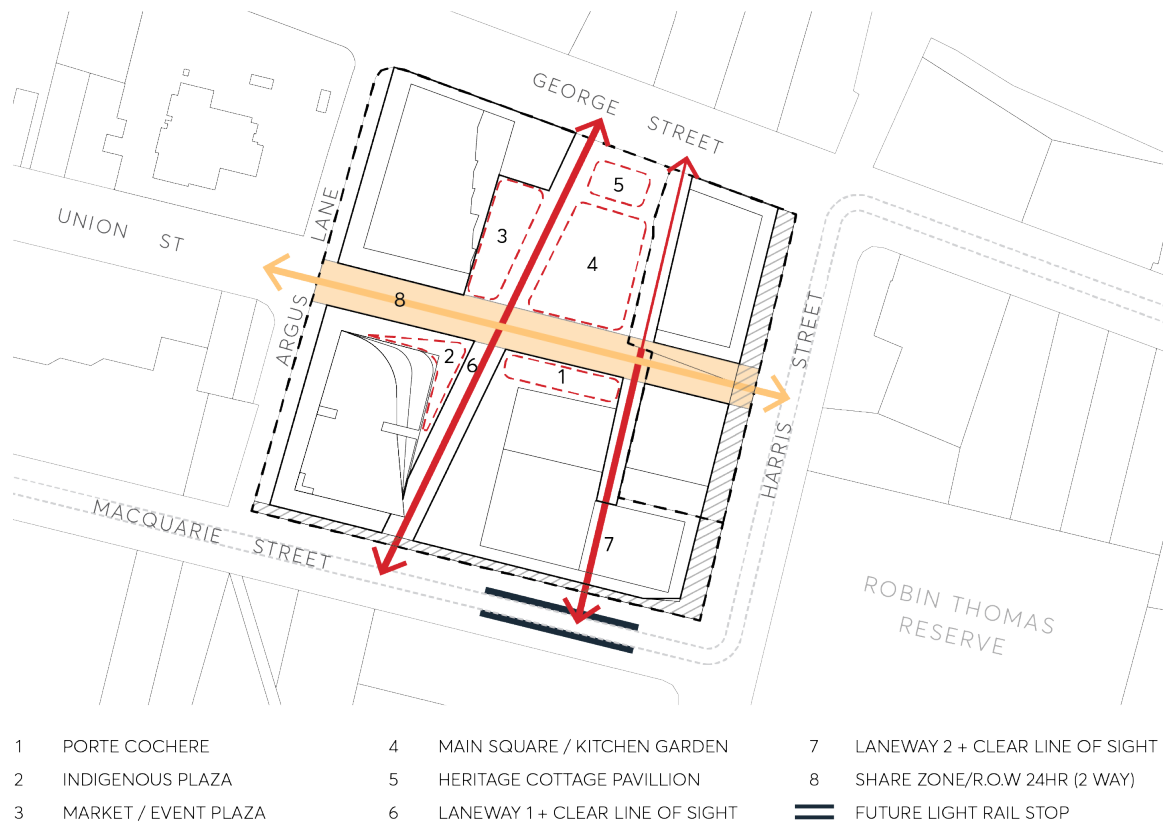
Open Space – Plazas, walkways and shareways
